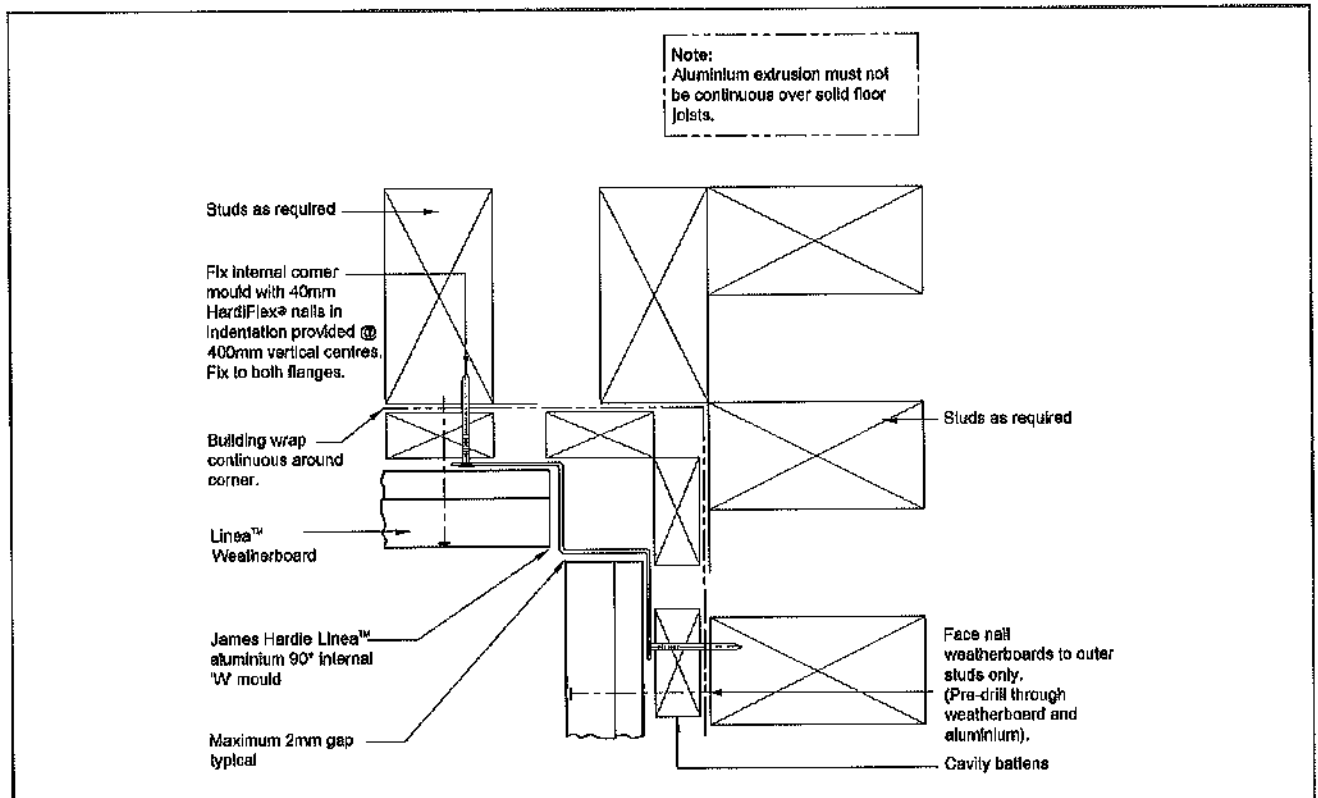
CAVITY INTERNAL 90° ALUMINIUM 'W' MOULD CORNER
